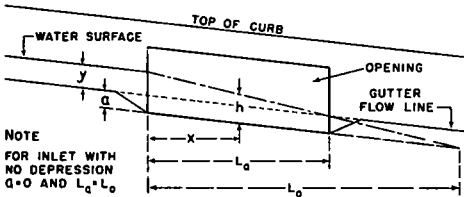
Diagrammatic Sketch of Typical Curb Opening Inlet
